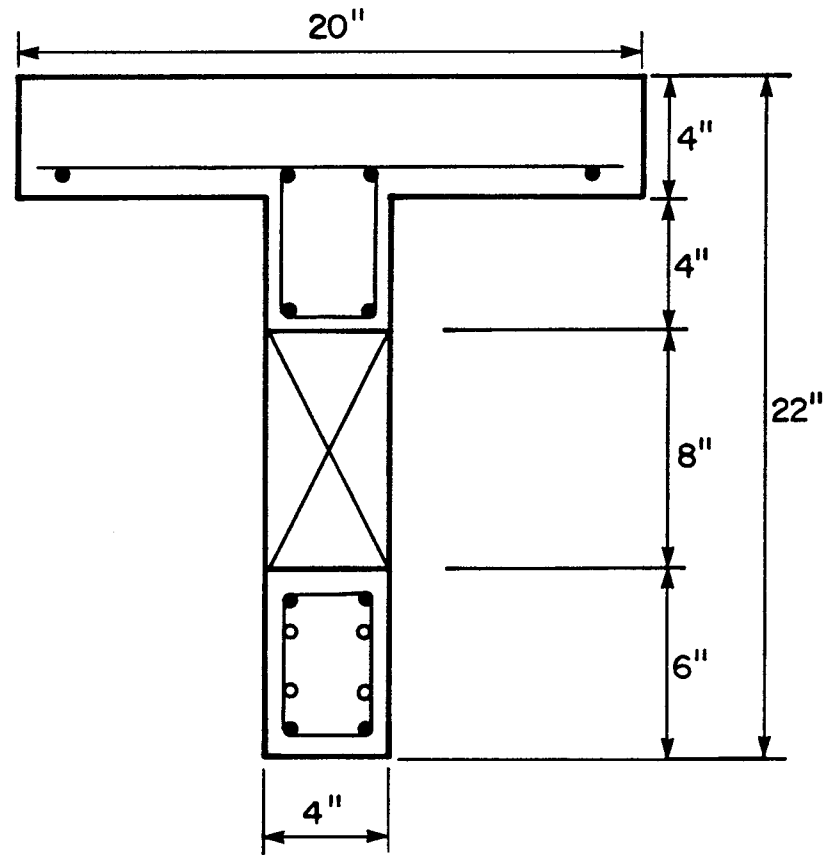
Typical Concrete Cross-Section - Series C.
